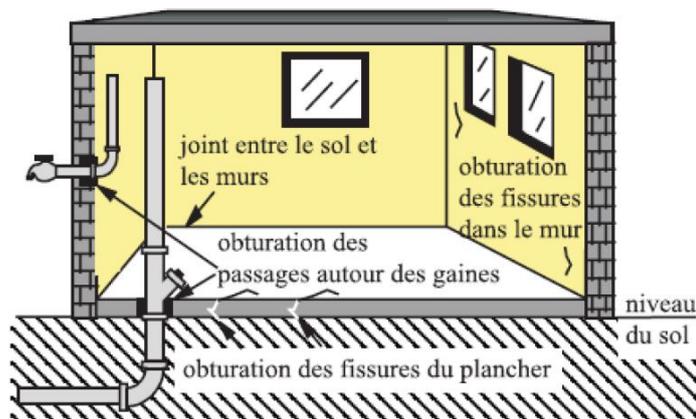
Thithening Works at Building Connection Zones (BCZ) to services (ROBE 2014)
